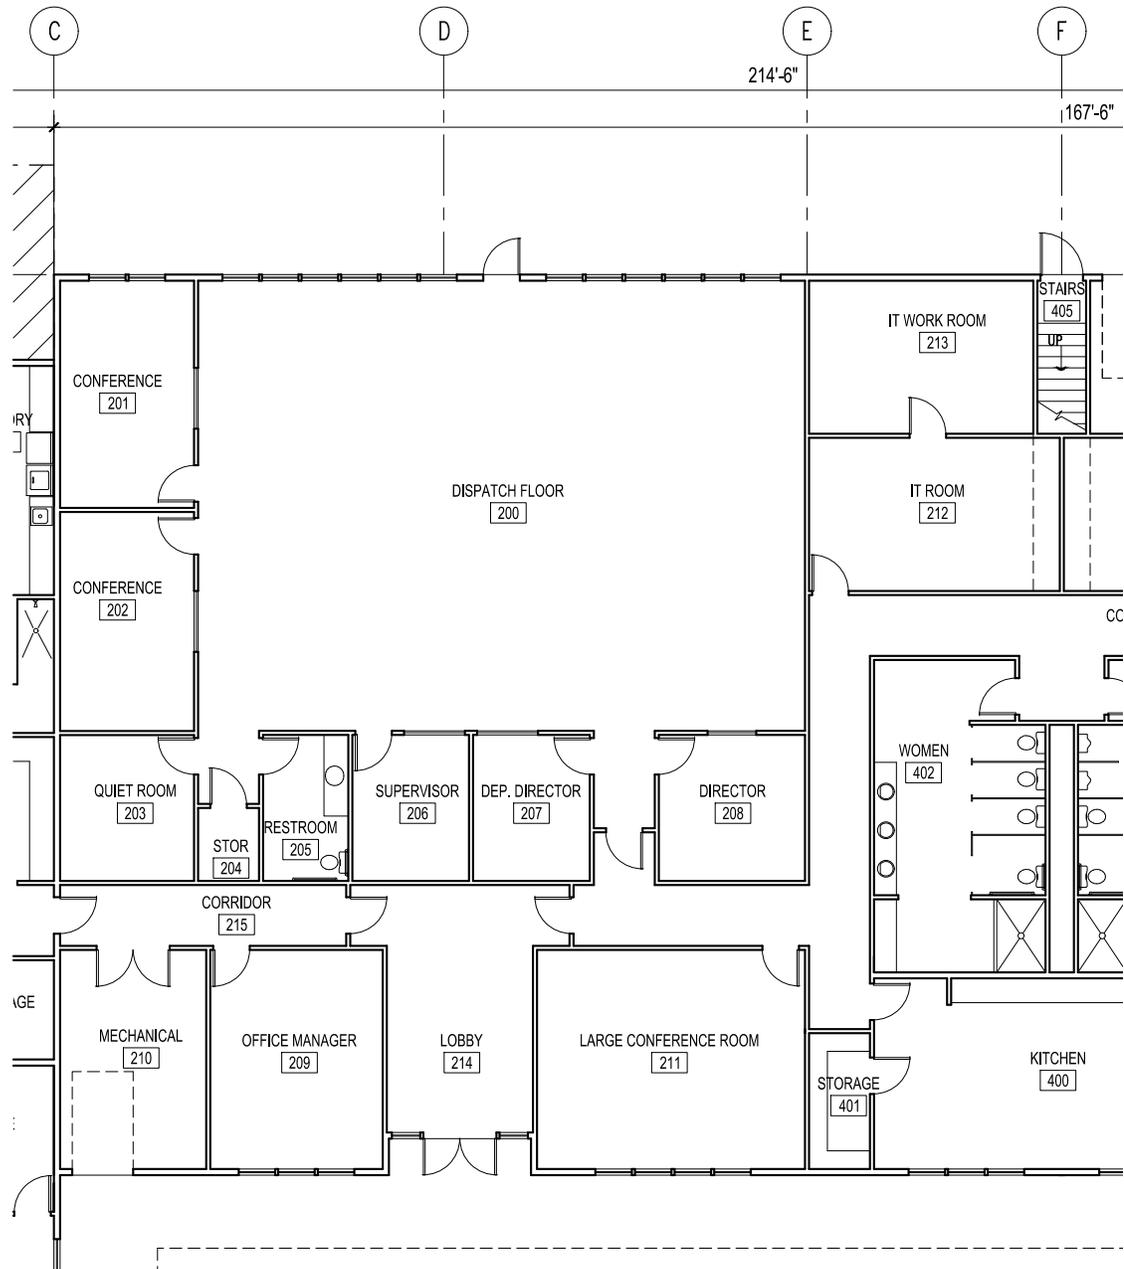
Preferred Building Concept: PenCom Floor Plan
